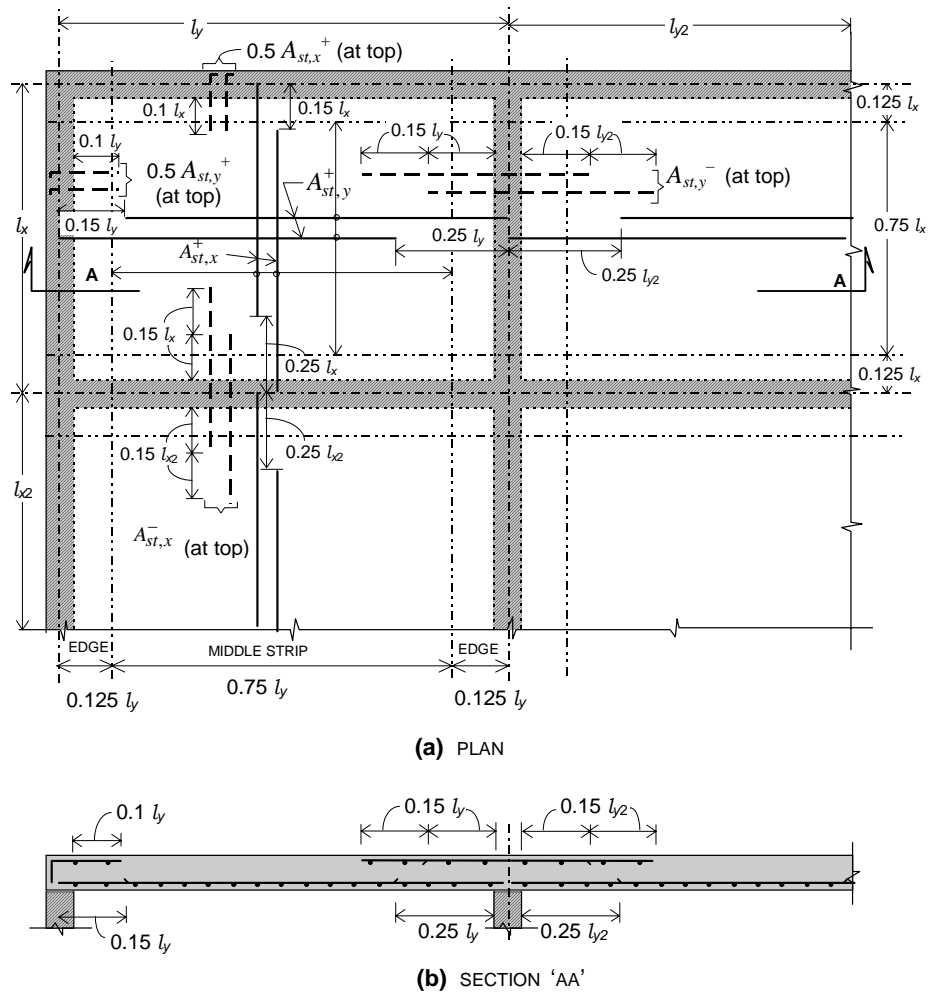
Detailing of flexural reinforcement in two-way 'restrained' rectangular slabs[†] (excluding corner reinforcement)
